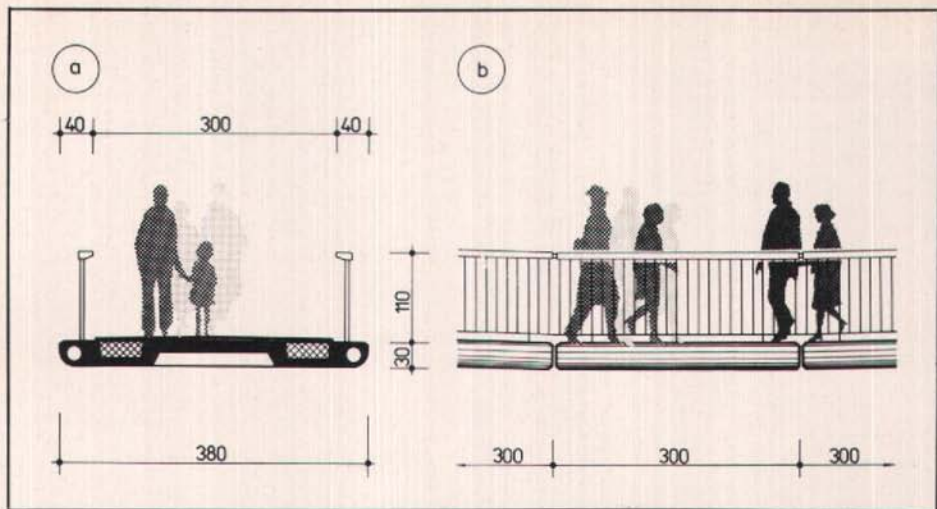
Typical architectural configuration of pedestrian bridge: (a) cross section; (b) elevation. Note: 1 cm = 0.3937 in.
